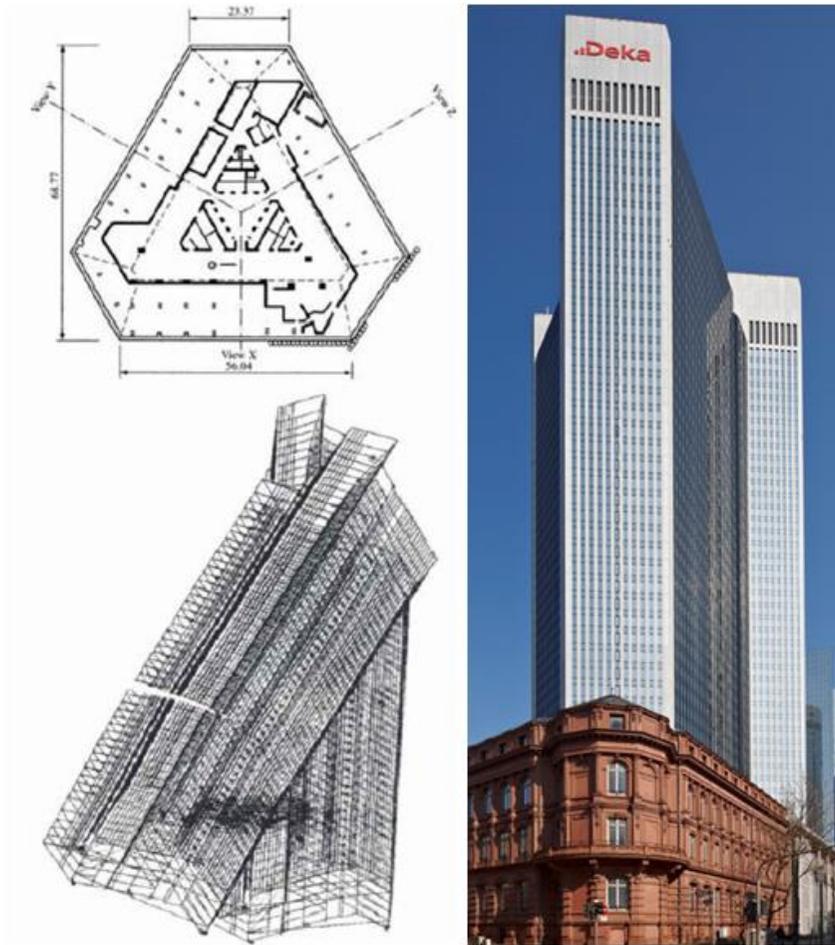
Characteristic Floor Plan of Trianon Building (left–top), Schematic Scenario of Possible Collapse (left–bottom) and Trianon Building, 1992, completed (right) [199, 200]
